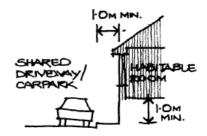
visual buffer between windows and driveways/ carparking spaces
